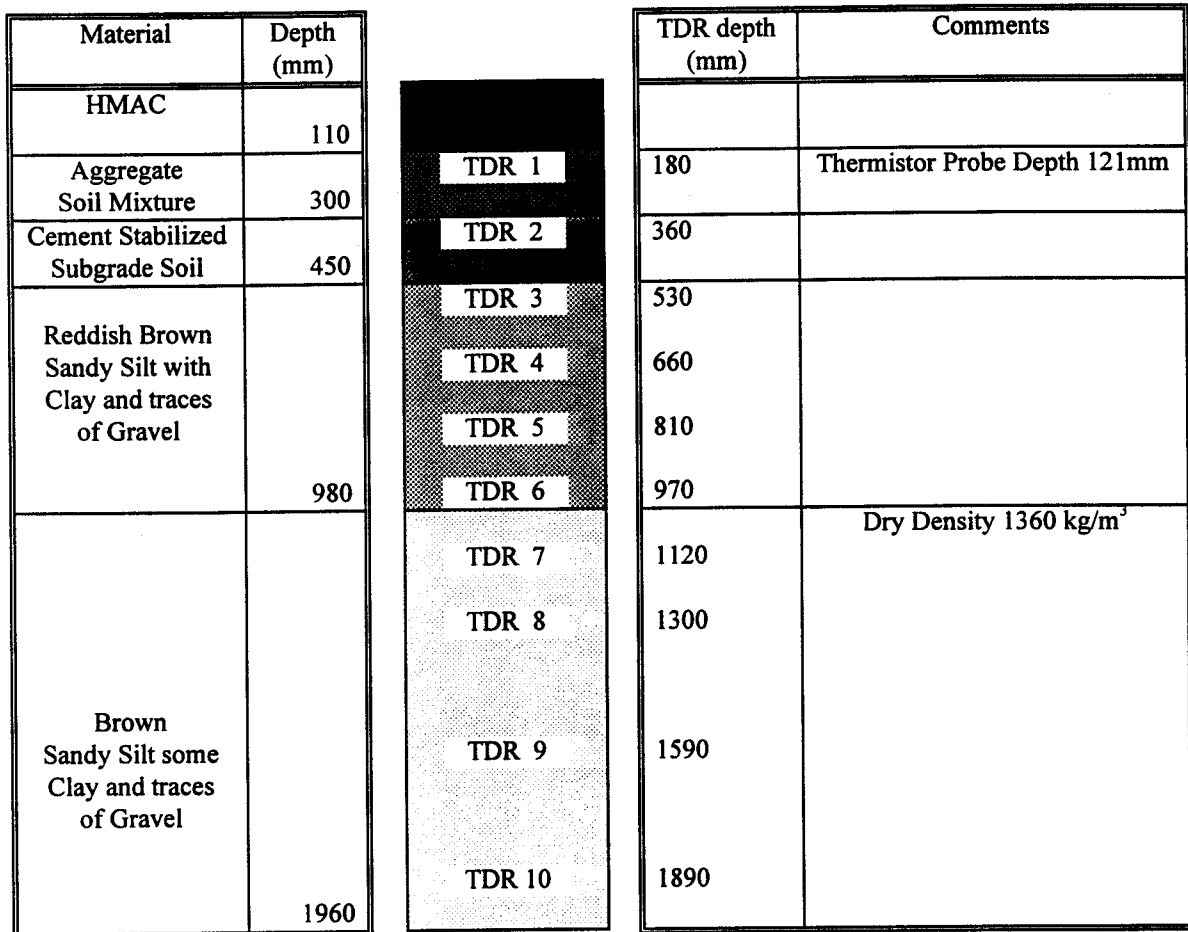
Profile of Pavement Structure and Probe Depths, Station 0-16
